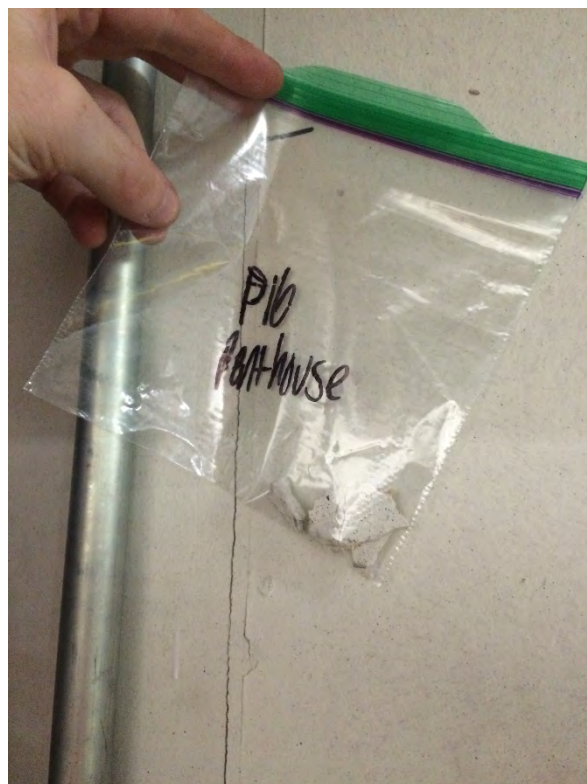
Asbestos sample A42, drywall joint compound collected from wall of penthouse in Pod P16. Joint compound contains 3% chrysotile asbestos.
